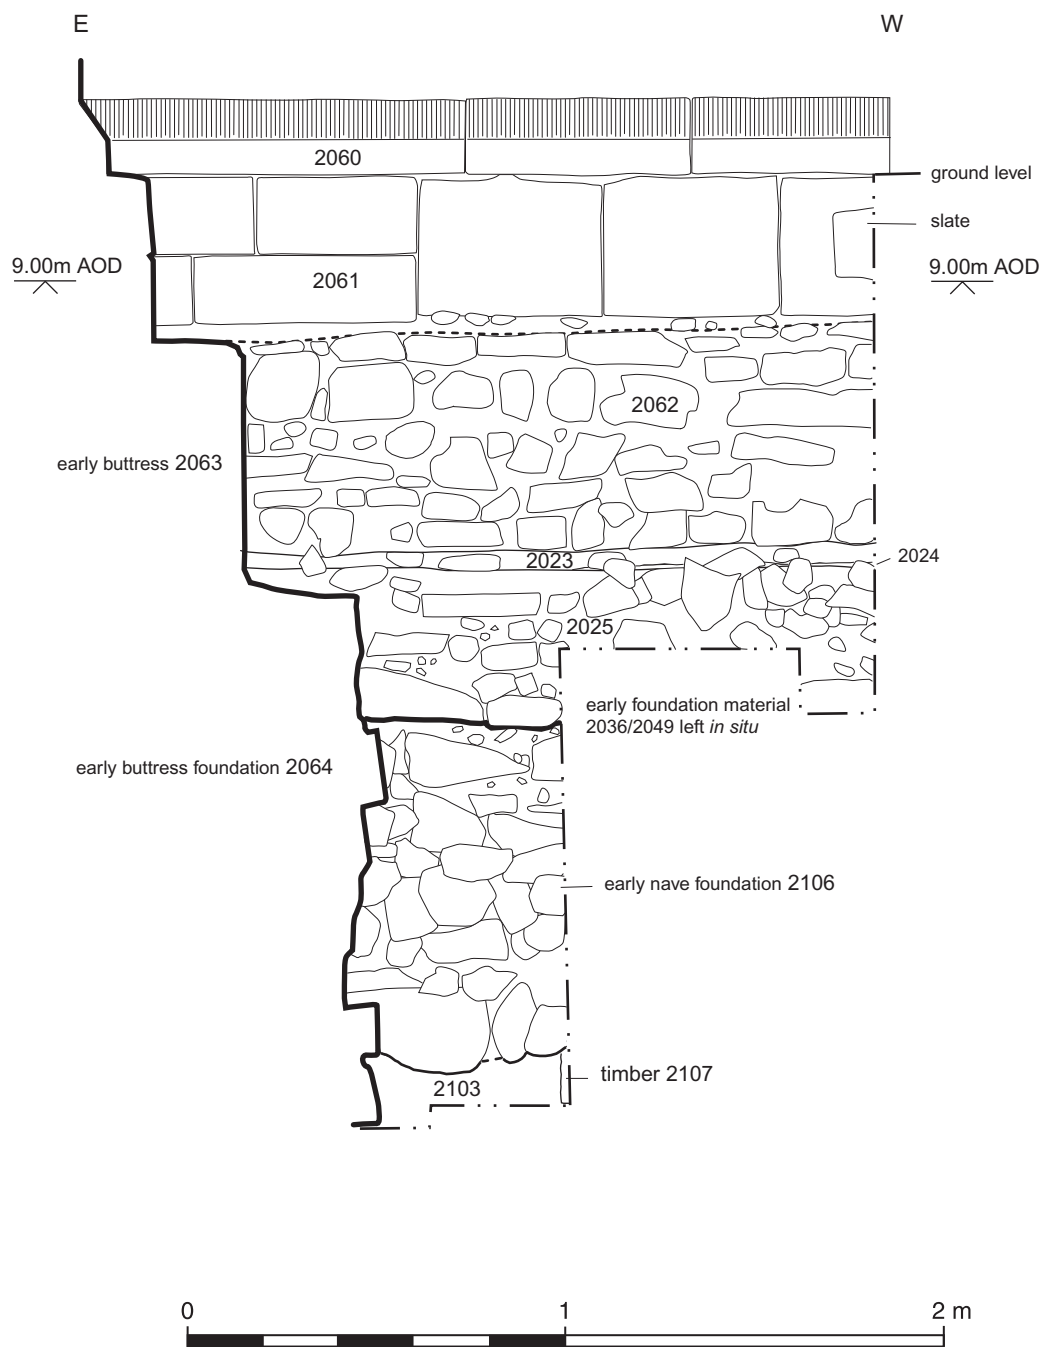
Trench 2, north-facing elevation. Scale 1:20
